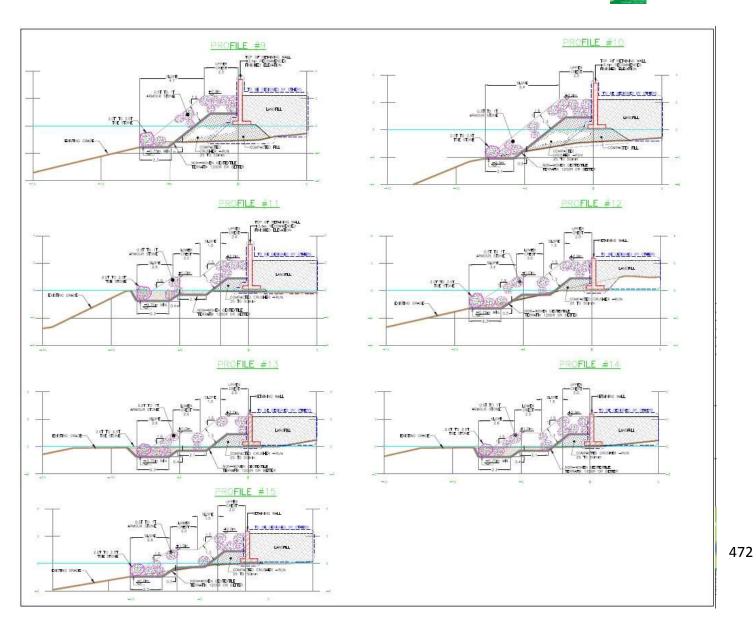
Cross-sections for armour stone revetment sheet 2
